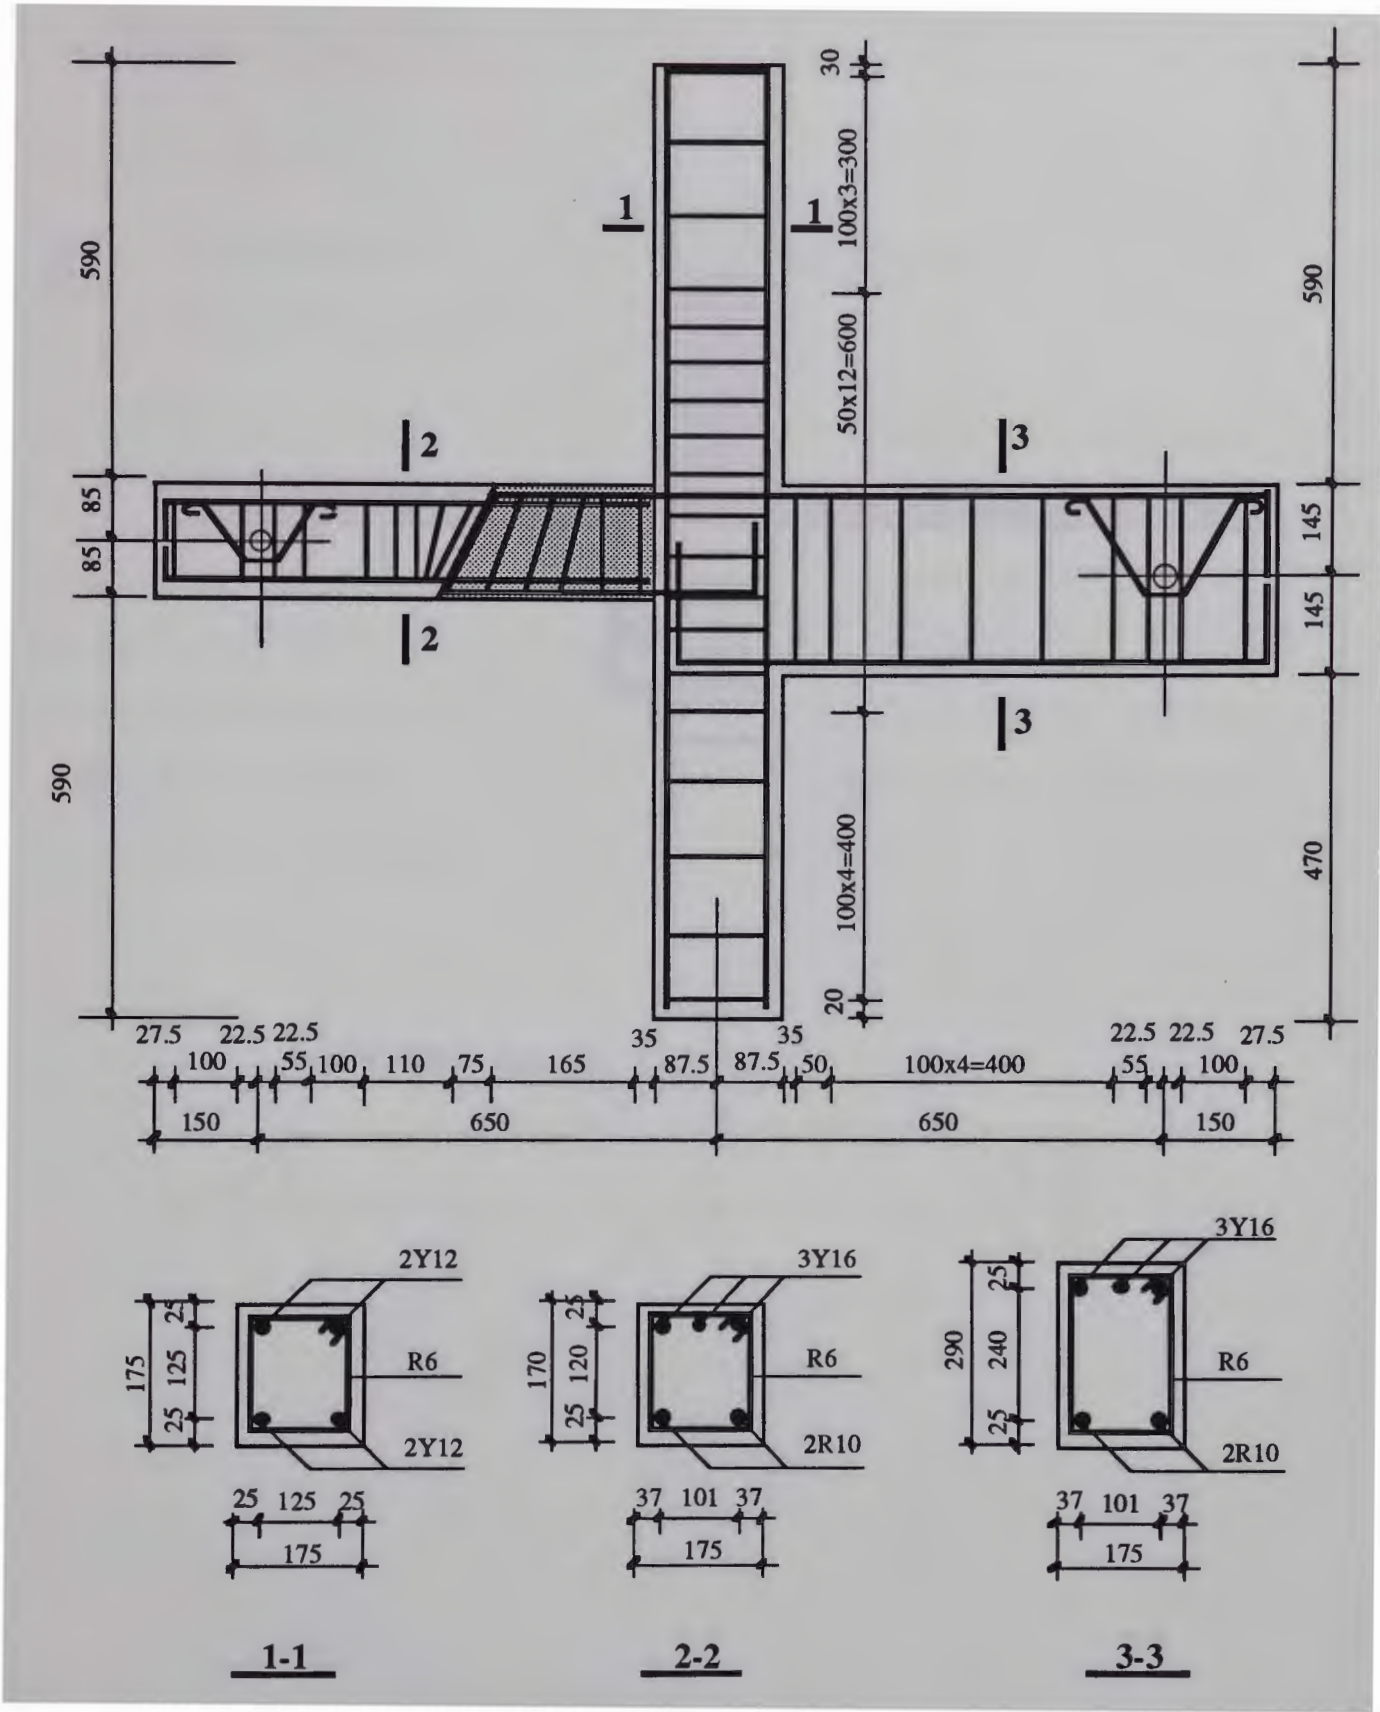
Detail of Specimens SPA2 & RPA2
